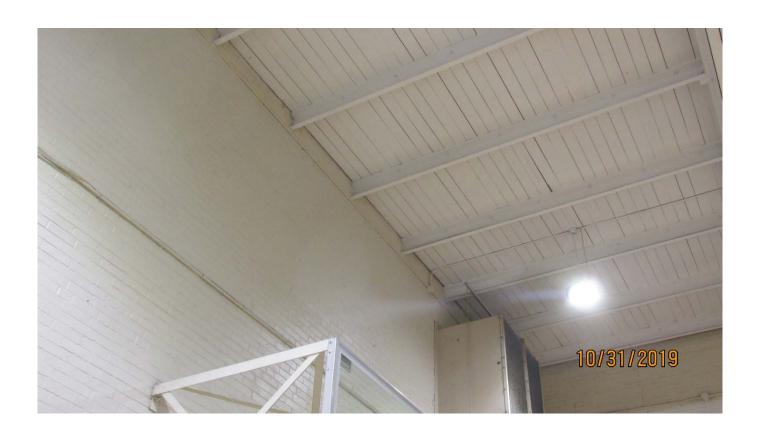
Interior Elevation – Southwest corner – Gymnasium
